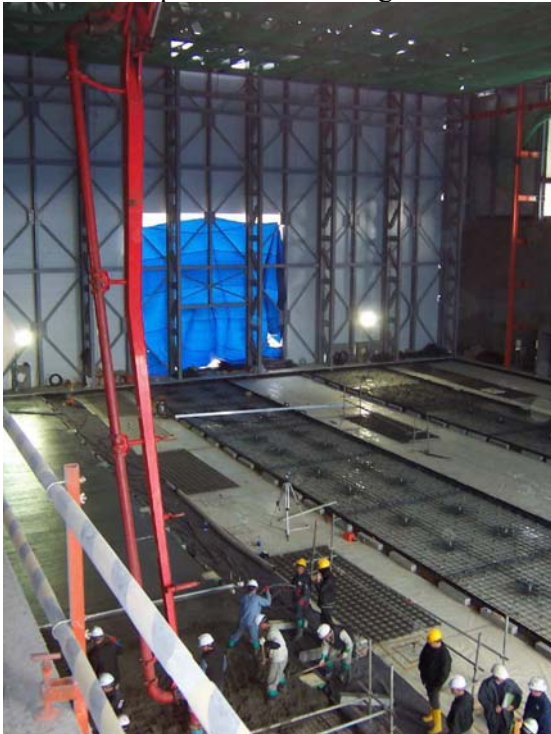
Construction photo showing wall support structure and steel reinforced concrete floor
